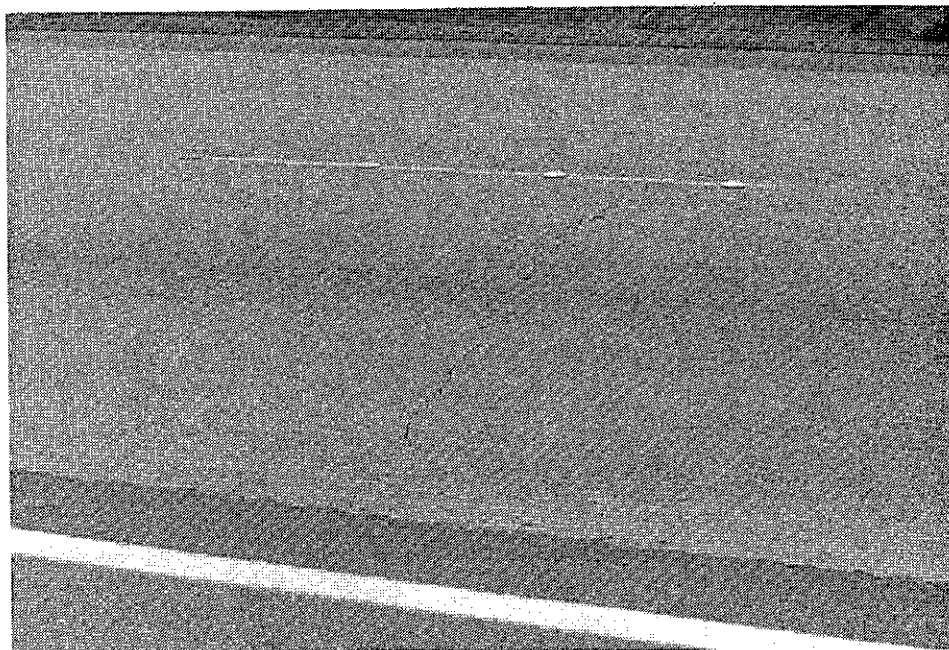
Typical crack when steel was placed at proper depth, just above pavement mid-depth.
